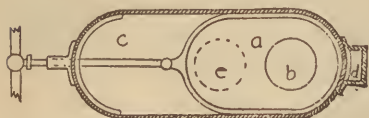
Valve and Receiver of Lucknow's Closet.
